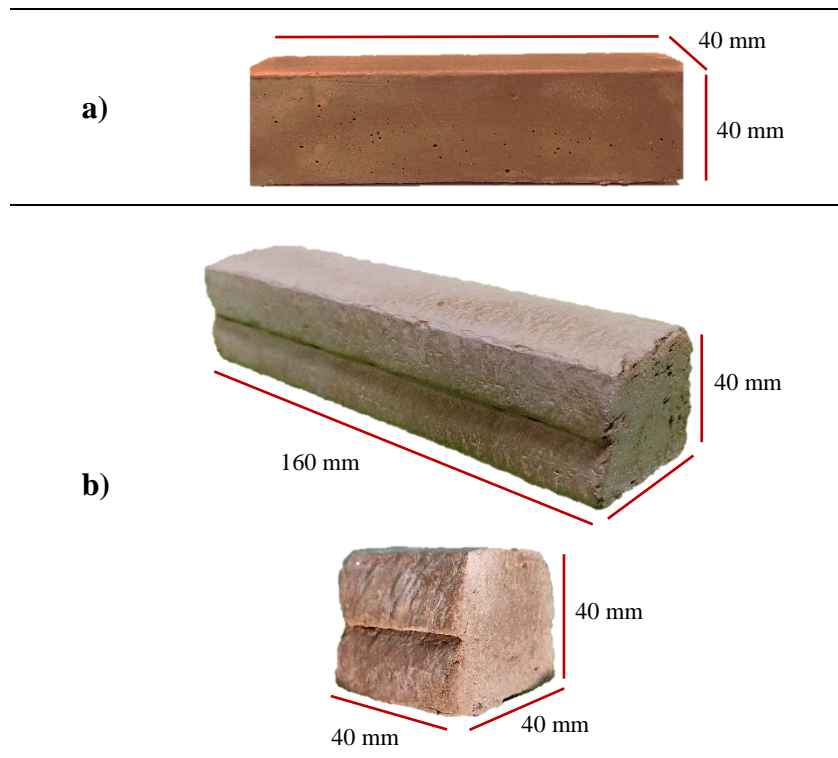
Representative images showing details of test specimens: a) Prismatic casted specimen with dimensions of 40x40x160 mm, b) prismatic and cubic 3D-printed specimens
